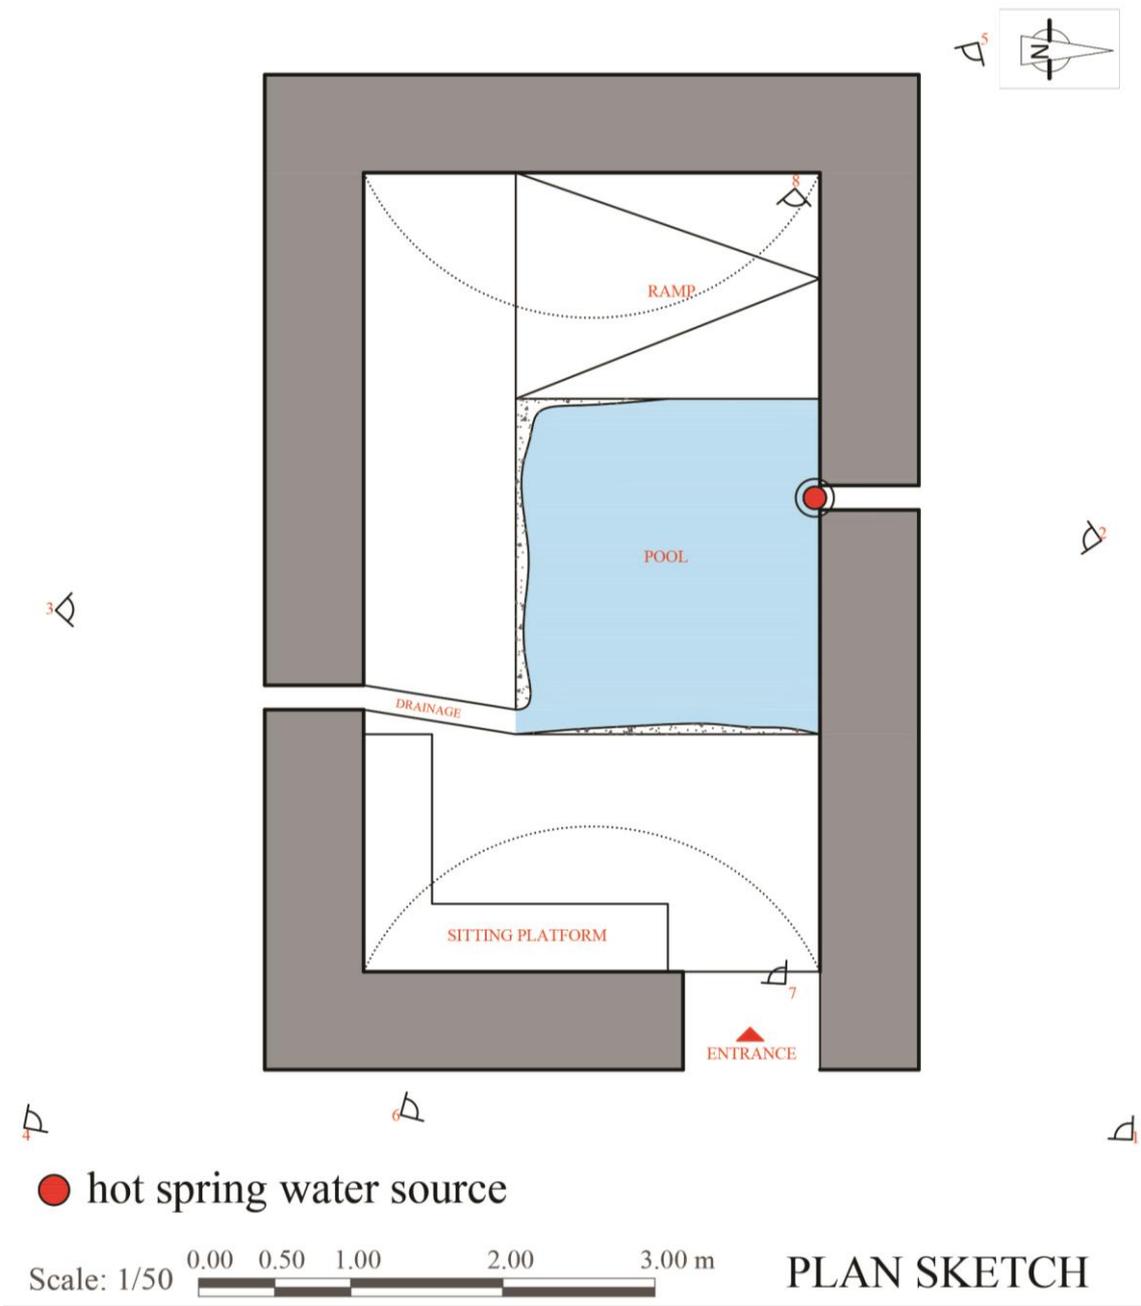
Kelalan Thermal Spring Bath B, Plan Sketch
